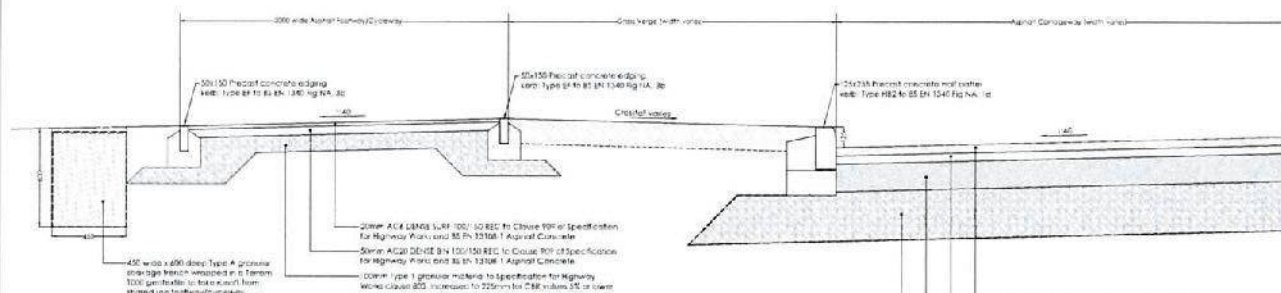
SECTION THROUGH ASPHALT CARRIAGEWAY (PSV 68+)
